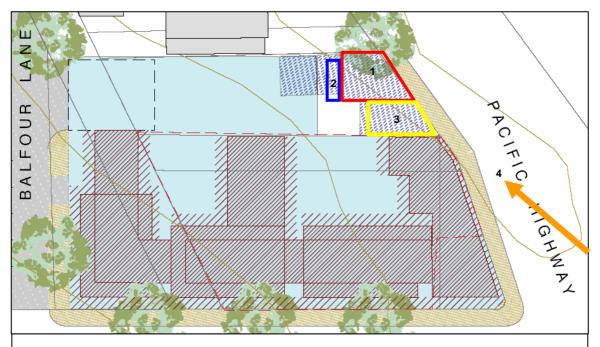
Balfour Lane Site Plan (Hill Thalis)
